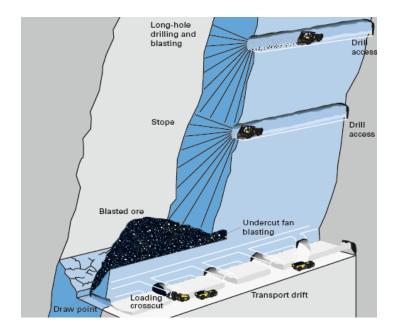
Sublevel open stoping layout, after (Tunnelbuilder Itd (Atlas Copco Rock Drills AB), 2007)
